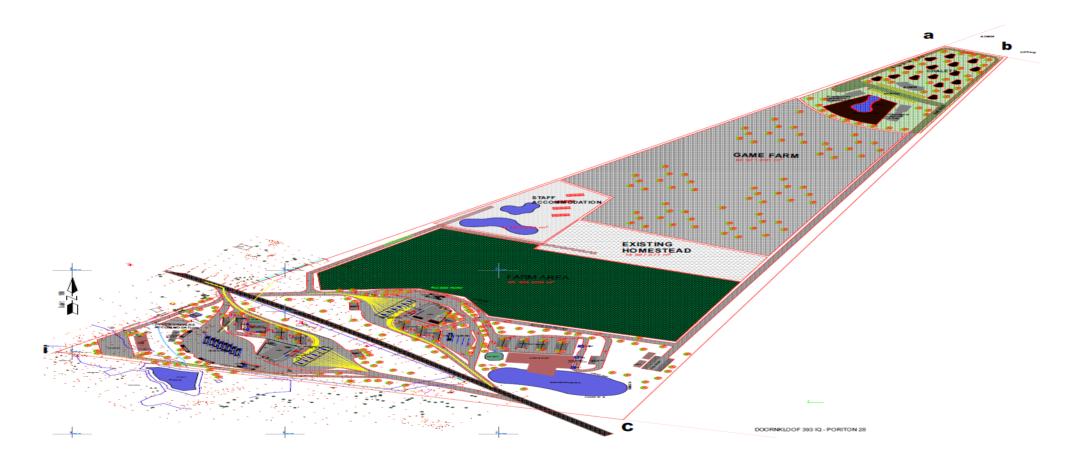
Site lay out plan for the proposed development (Mawenje 2017)
